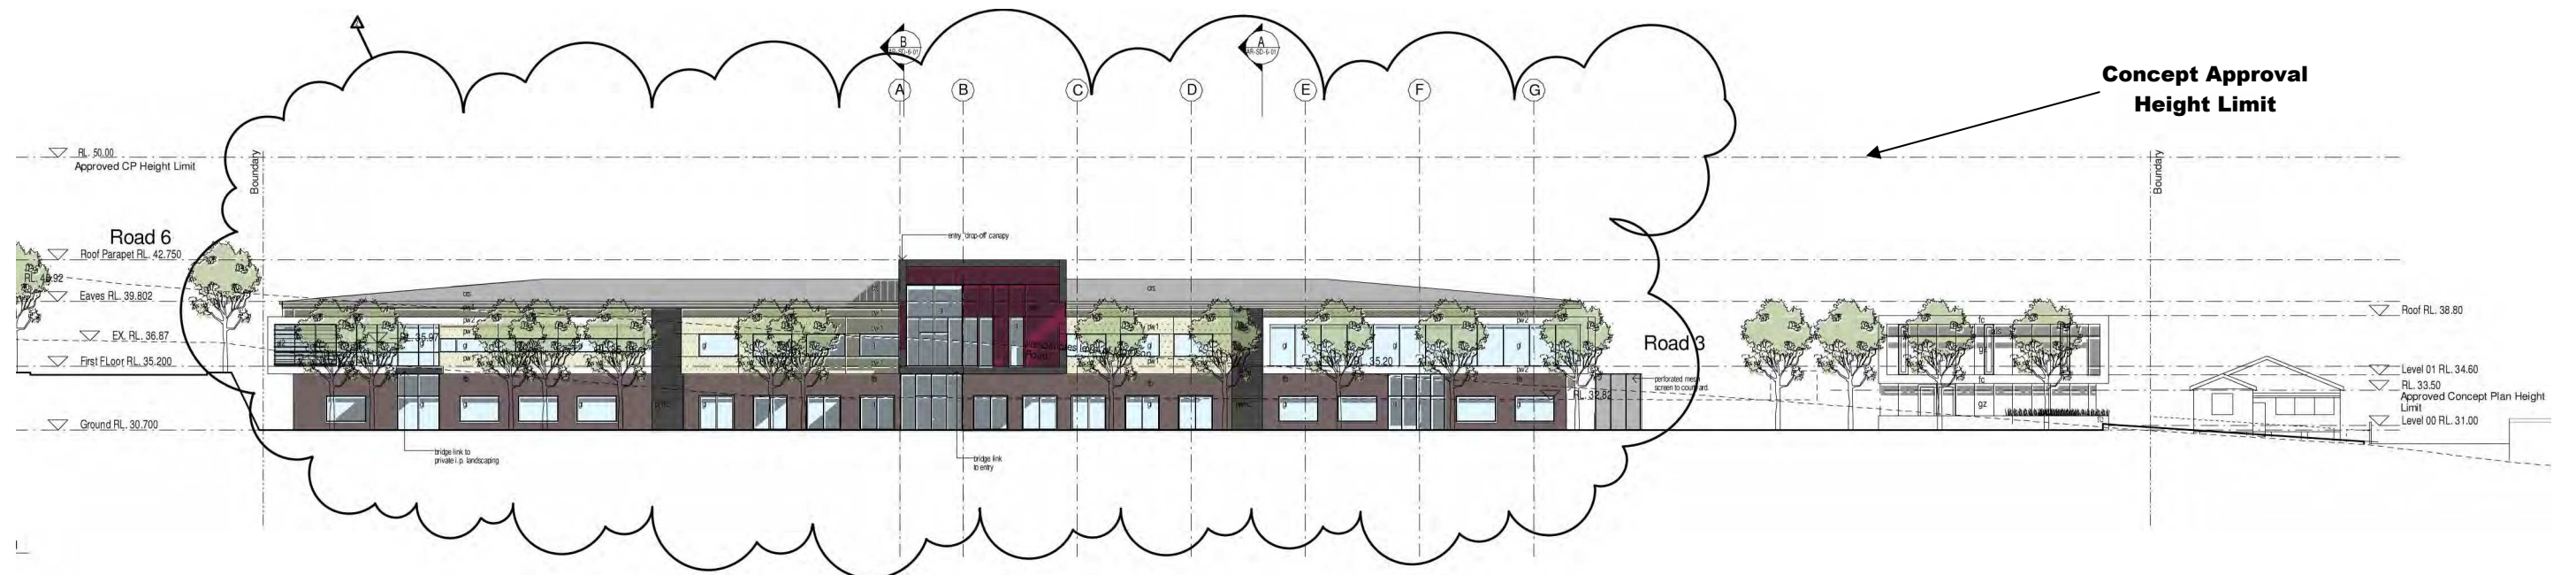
Proposed south elevation illustrating building height is below approved Concept Plan requirement as contained in the Section 75W EA
